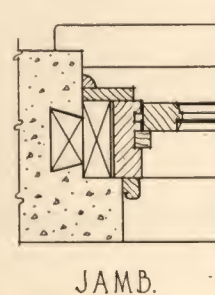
DETAIL "E" SUGGESTED TREATMENT FOR CONCRETE WALLS
